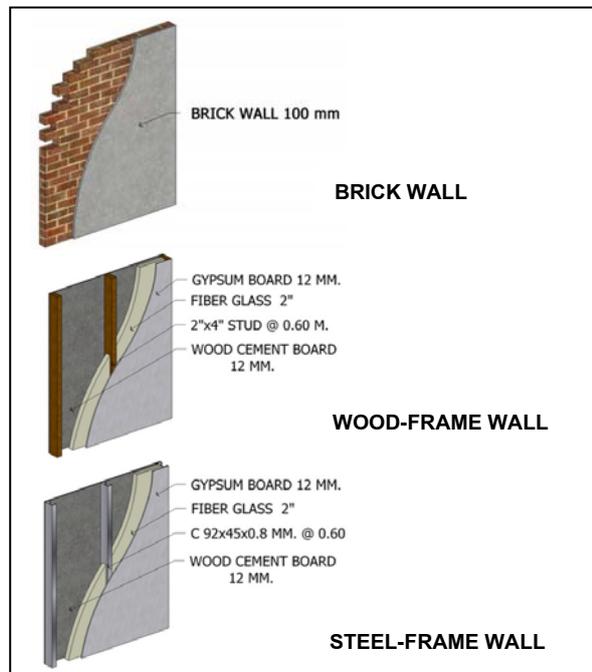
Exterior walls of concrete-frame, wood-frame, and steel-frame houses
